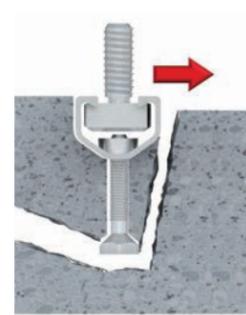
Internal forces and detailing requirements for anchor reinforcement to resist shear loads; section view.
